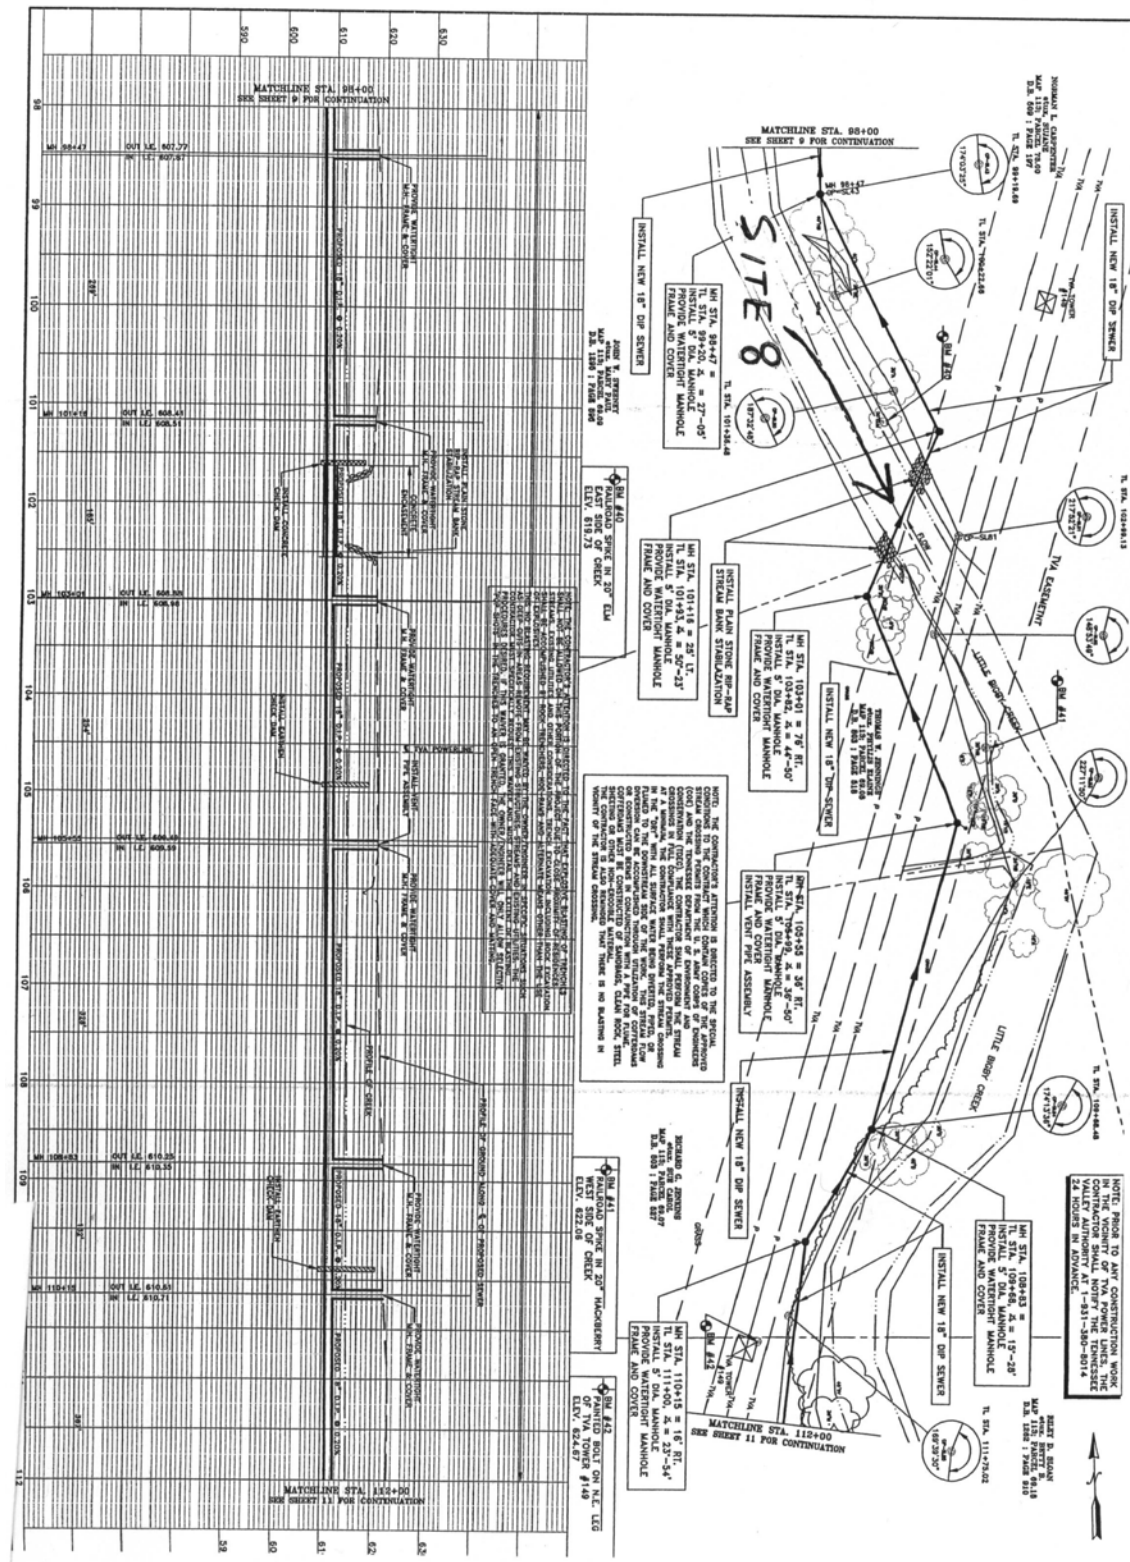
Plan sheet 10, site 8 on Little Bigby (new crossing)
